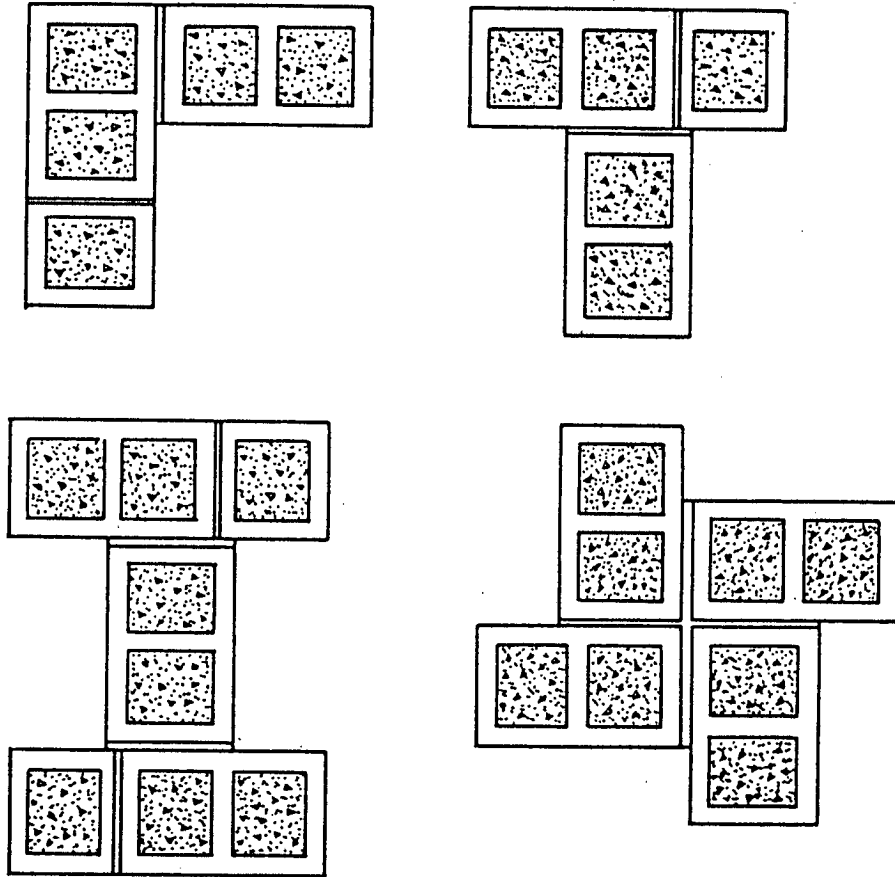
Methods of constructing blockwork masonry columns with different shapes and configurations.
